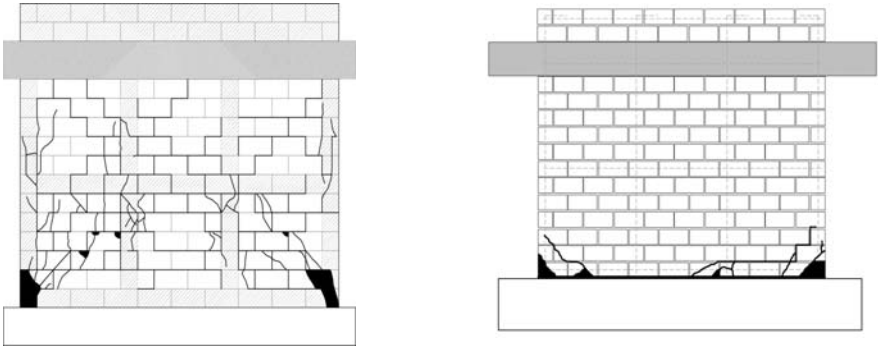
Wall cracking and failure modes of partially and fully grouted walls
